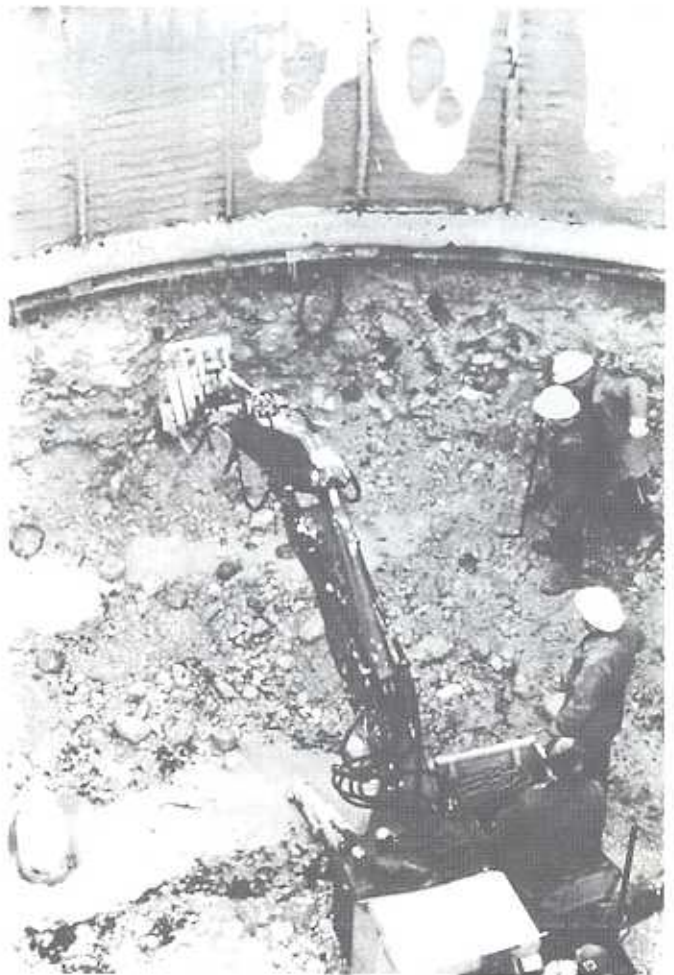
Caissons under groundwater built using jet-grouting (railway bridge over the Fella River, Italy): excavation inside the caisson
